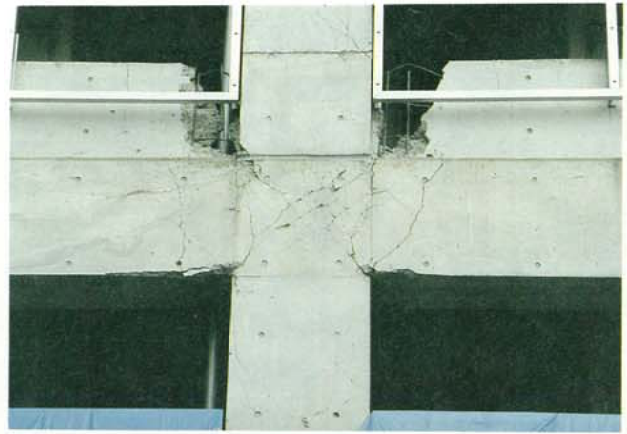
Fracture at the beam-column joint part(RC)
